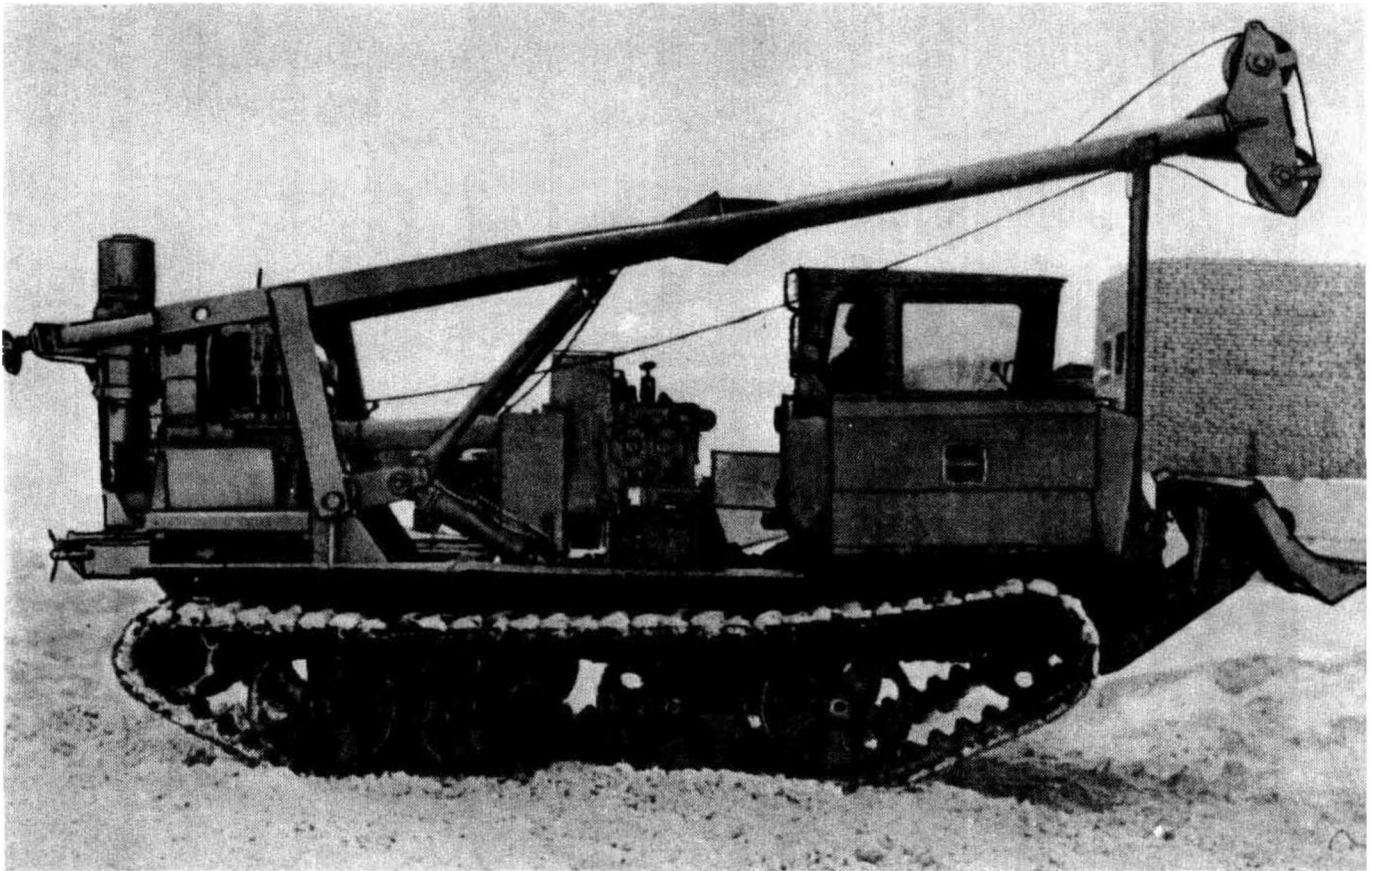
CBA-500 drill rig mounted on caterpillar
